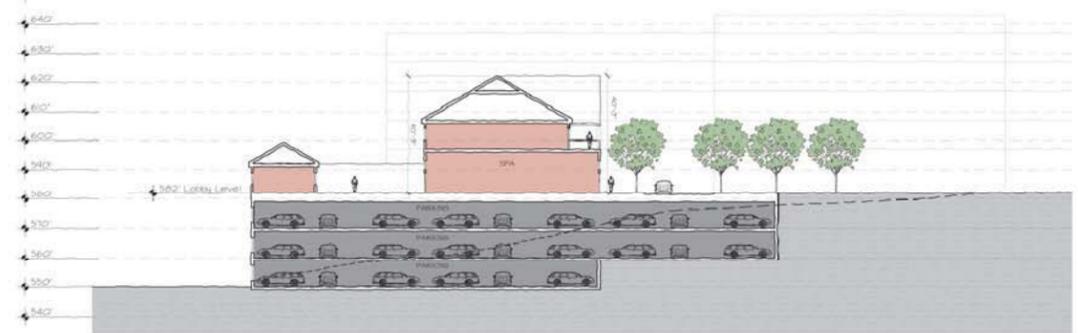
shows a detail sheet of the hotel and spa area and cross-sections through the proposed development (refer to the larger image of the detail sheet provided under separate cover). The spa facility is two stories, or about 40’ in height. The hotel will appear as four stories from the front (north side) and five from the golf course side, taking advantage of the grade change in this area of the site. The hotel is an average of 70’ tall measured from ground level at the front of the building to the midpoint of the highest roof ridge. To illustrate the types of architectural styles that might be used for the hotel and village area, several character images of hotel buildings and a description of the project architect’s intentions and objectives are provided later in this section under “Visual Resources.”
